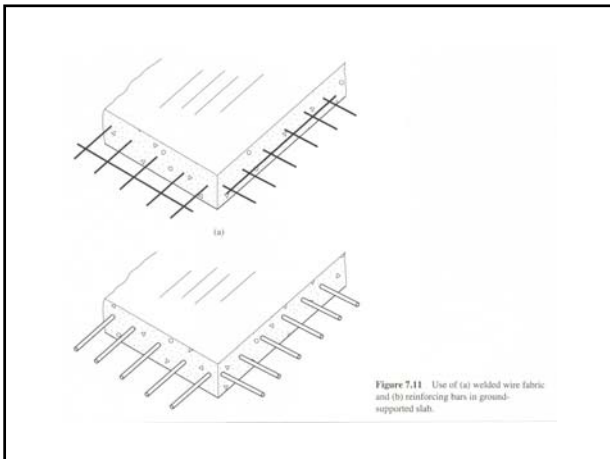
Use of (a) welded wire fabric and (b) reinforcing bars in ground-supported slab.
